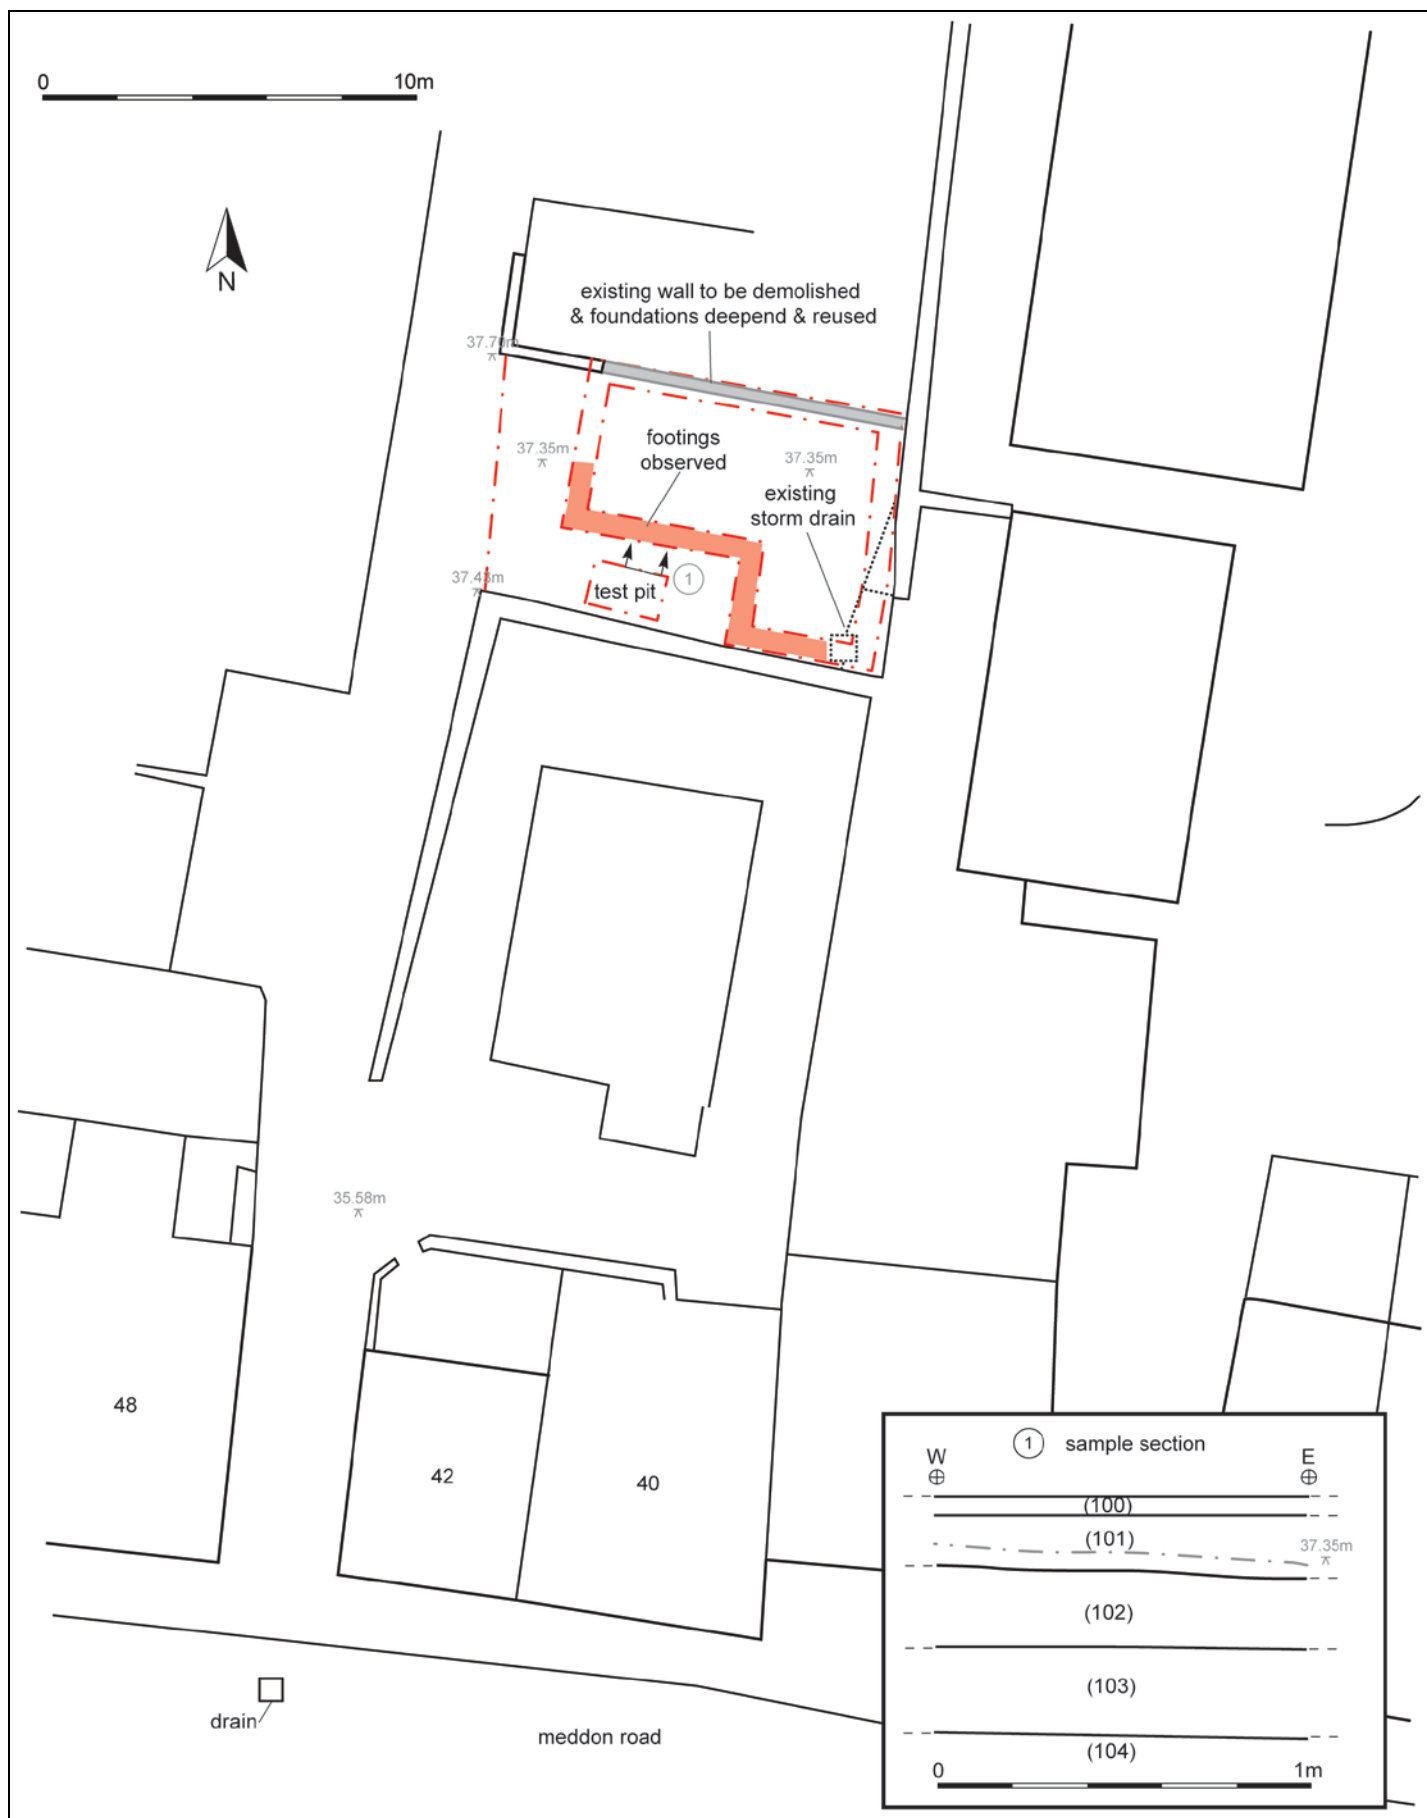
Site plan, observed footings shaded in red (Insert: sample section from test pit).
